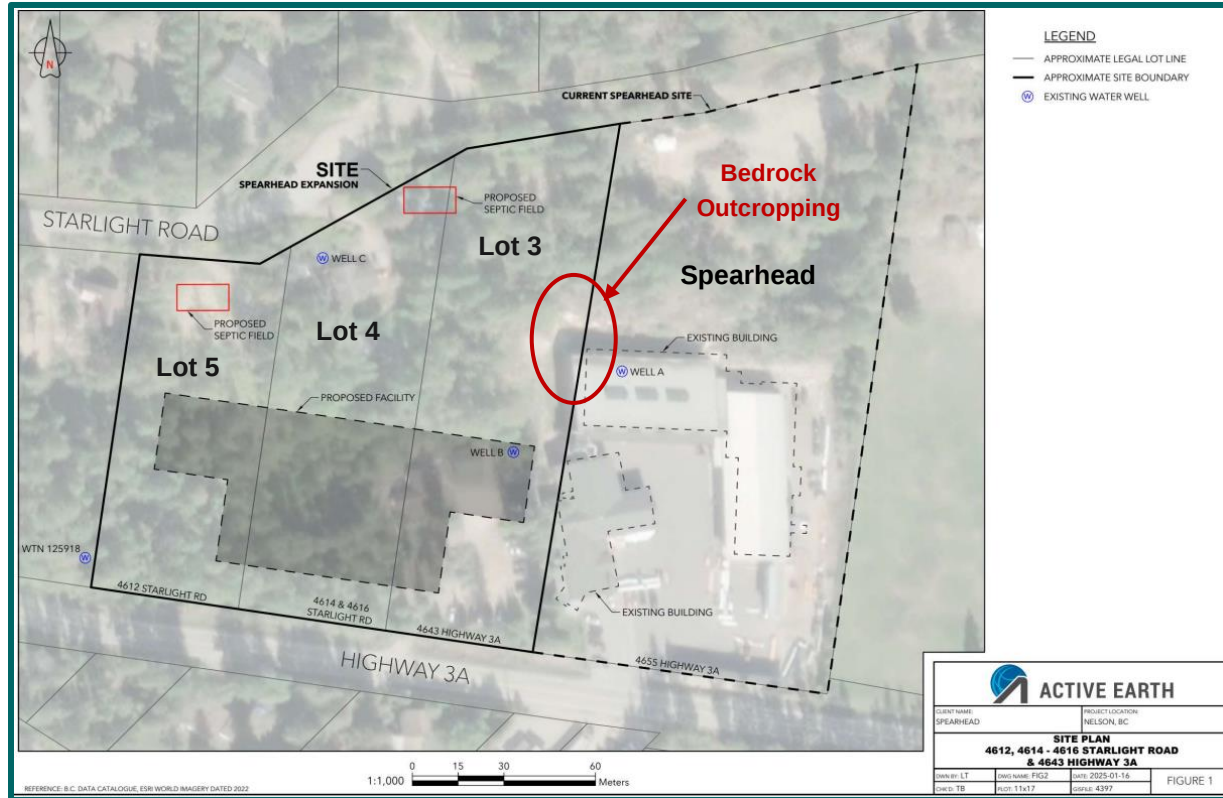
Property Layout with Proposed Facility Location (Active Earth, 2025)
